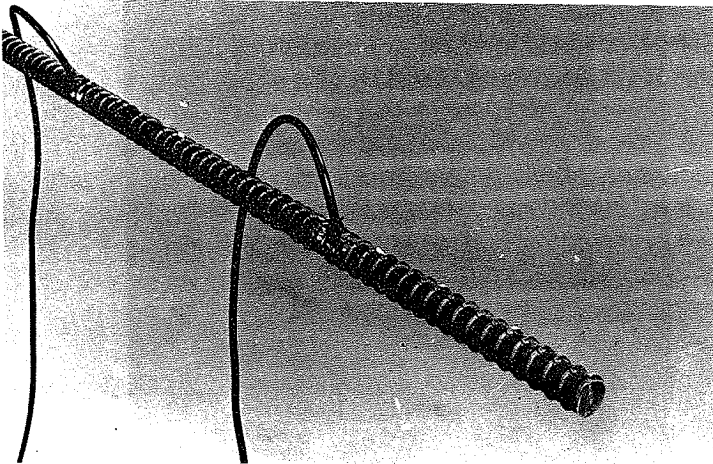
An example of a bar containing 9 strain gauges used in S.B.-specimens.
